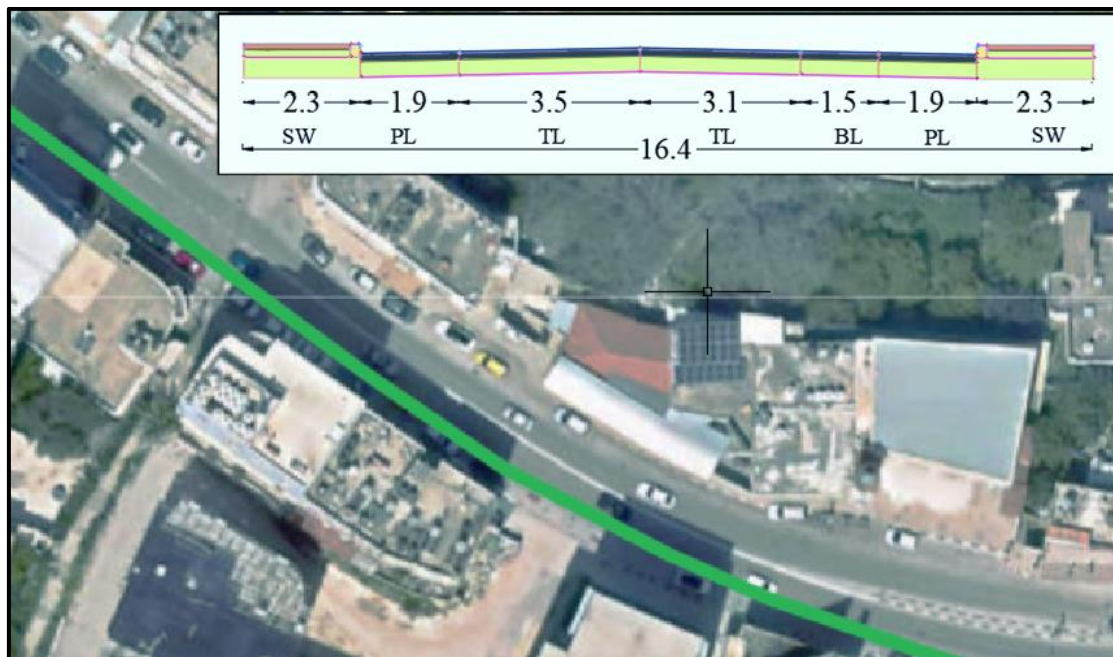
Distribution Of Rafedia Street Elements With a BL, Section No.2
